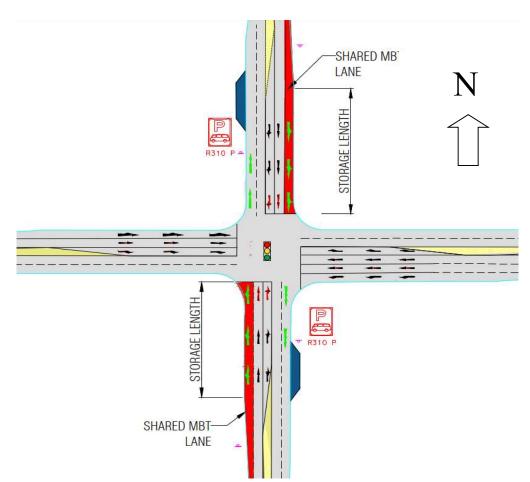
Layout Plan of Model Design 1 for Shared MBT Lane on N-S Corridor
